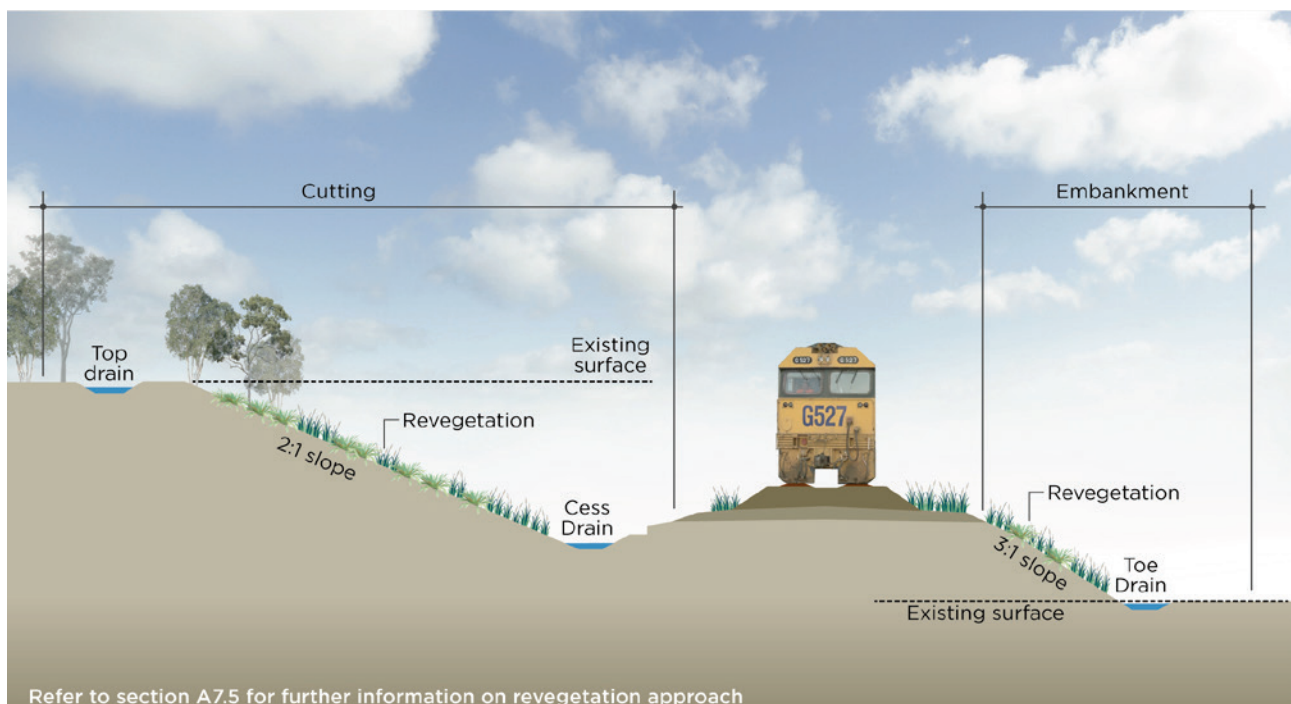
INDICATIVE EMBANKMENT, CUTTING AND TRACK DRAINAGE
